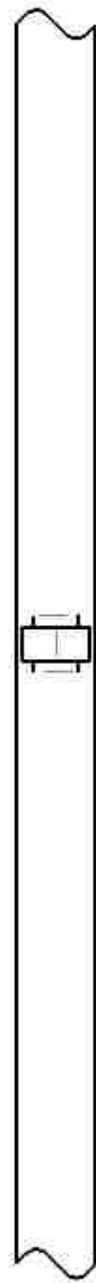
Side View. Bi-Cantilevered Drain/Cantilever System composed of a Circular Drain and two Rectangular-shaped Cantilevers.
